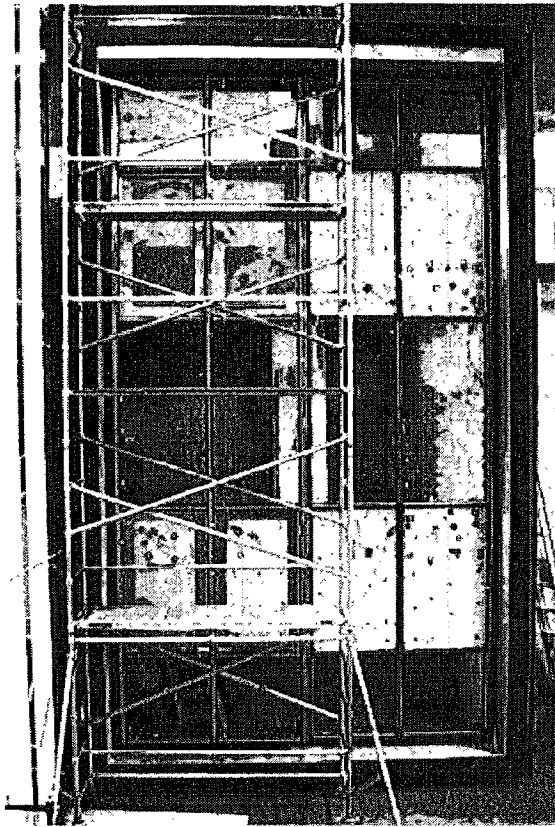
Photo taken when main frame and spandrel panel completed.
